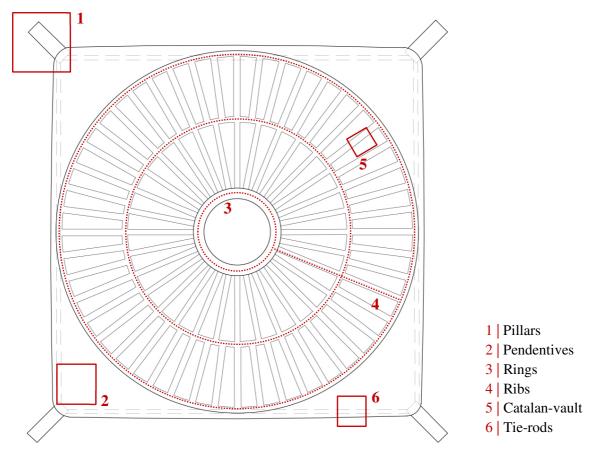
Outline of the main constructive elements composing the Pavilion Dome of Practical Room (BA.3.59).
